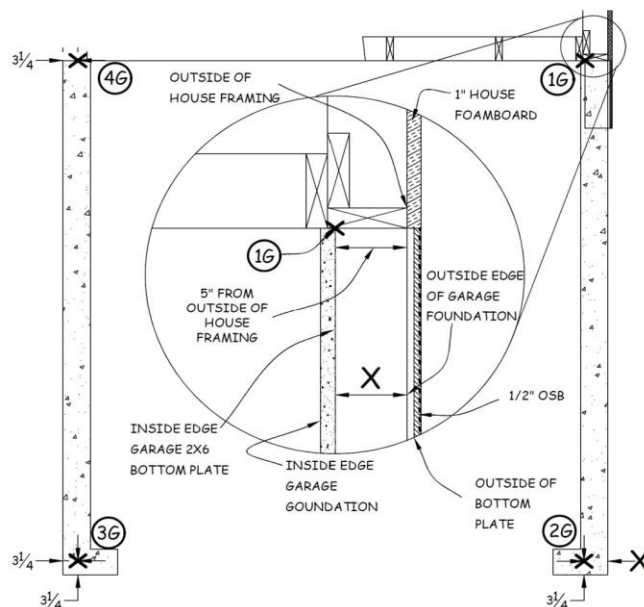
Garage Sill Plate Chalk Lines Prior to House Walls.
